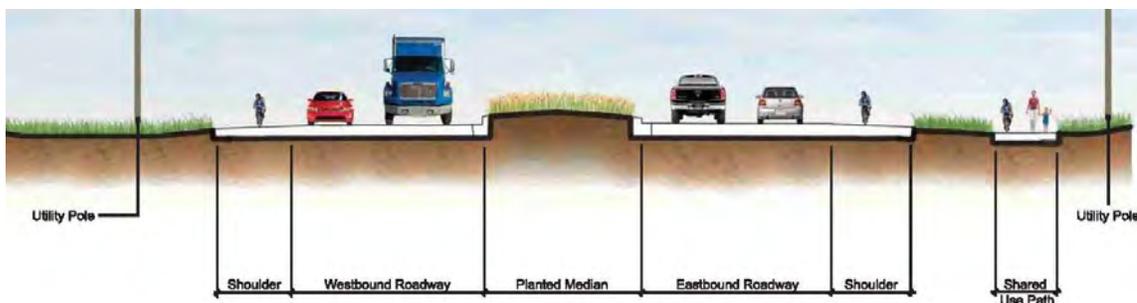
Alternative 3 Base Improvement Open Section Segment C Typical Section
